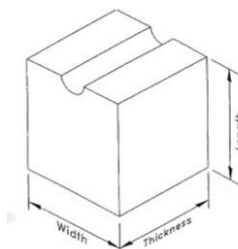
Design for timber specimen dimension (ASTM D5764-97a)
